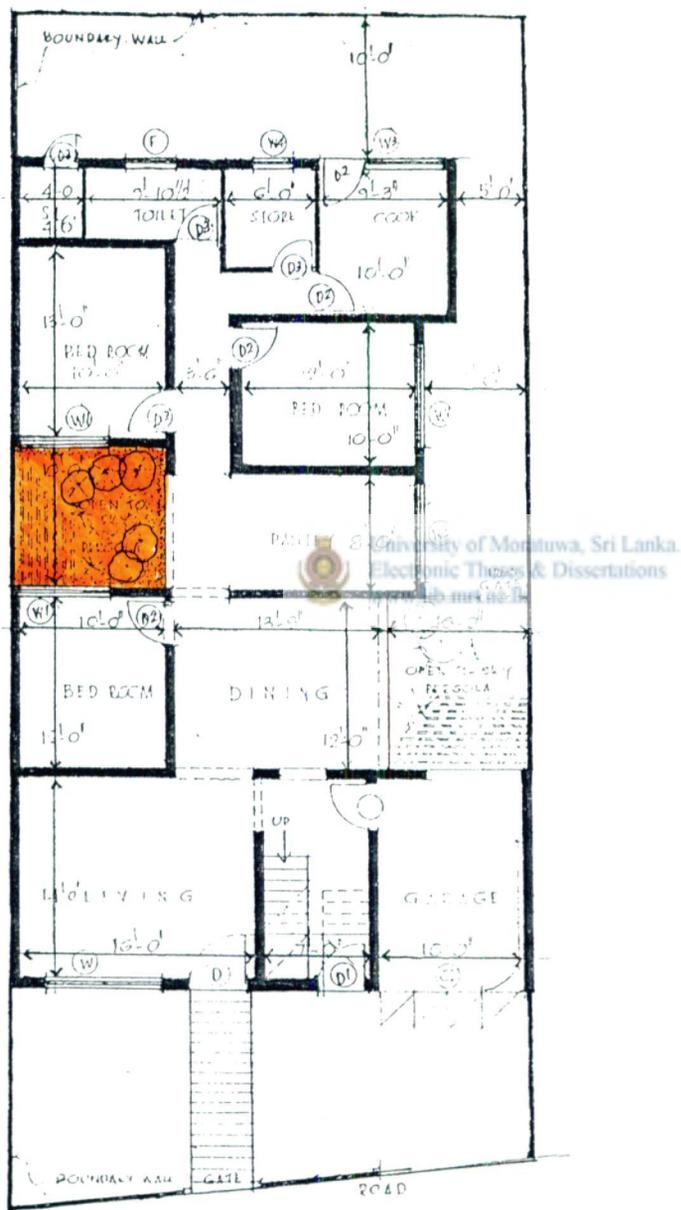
The floor plan of the selected urban house (with the model courtyard)
